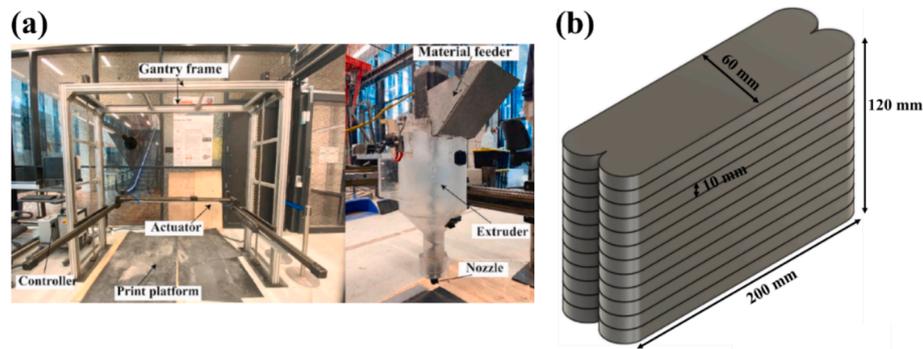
(a) Gantry type 3D printer (b) Schematic of a printed specimen.
